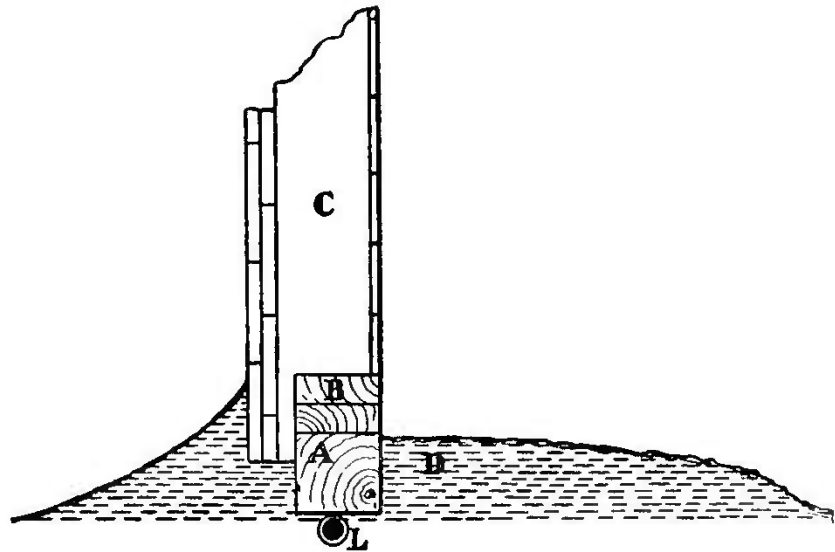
Plan of Out-door Silo without Stone Foundation.
